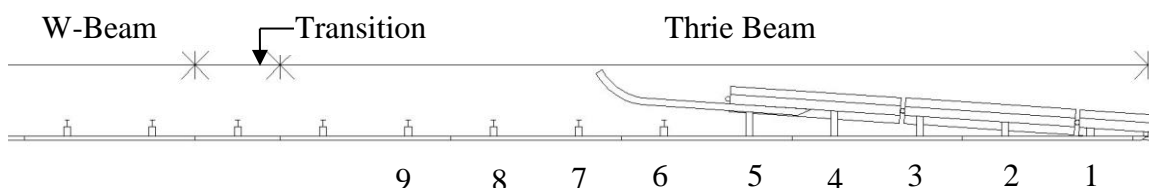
Thrie Beam with Fully-Blocked Rail and Cantilever Beam – Impact Locations
